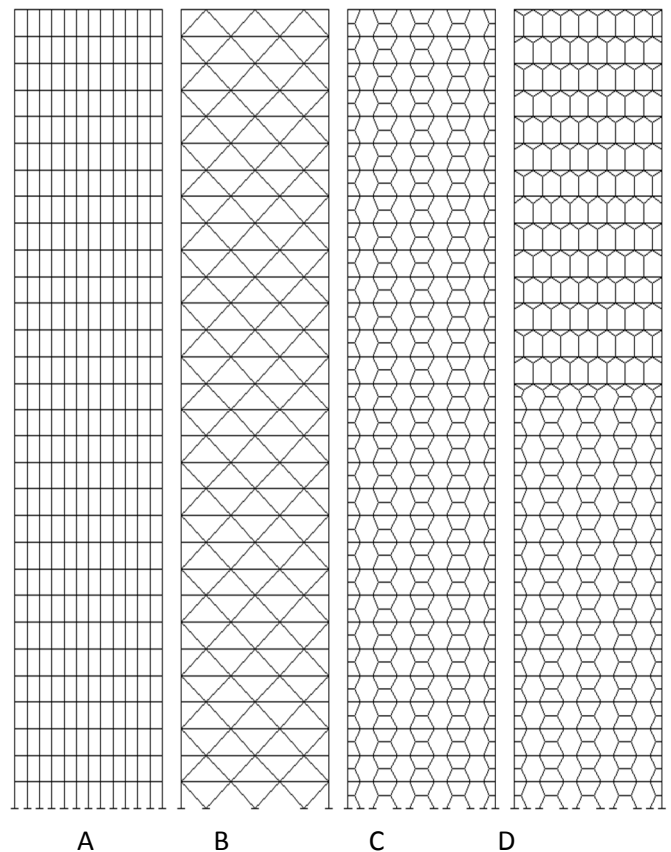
2D elevation of each structural system A. framed tube B. diagrid C. horizontal hexagrid D. combined horizontal and vertical hexagrid
